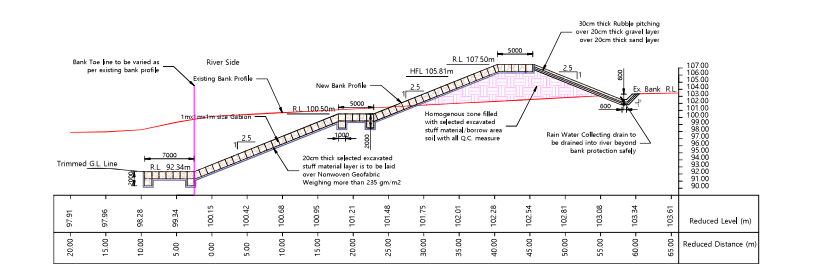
(B) TYPICAL CROSS SECTION OF HIRAPURA BARRAGE GUIDE BANK - U/S RHS @ CH. 120 m
